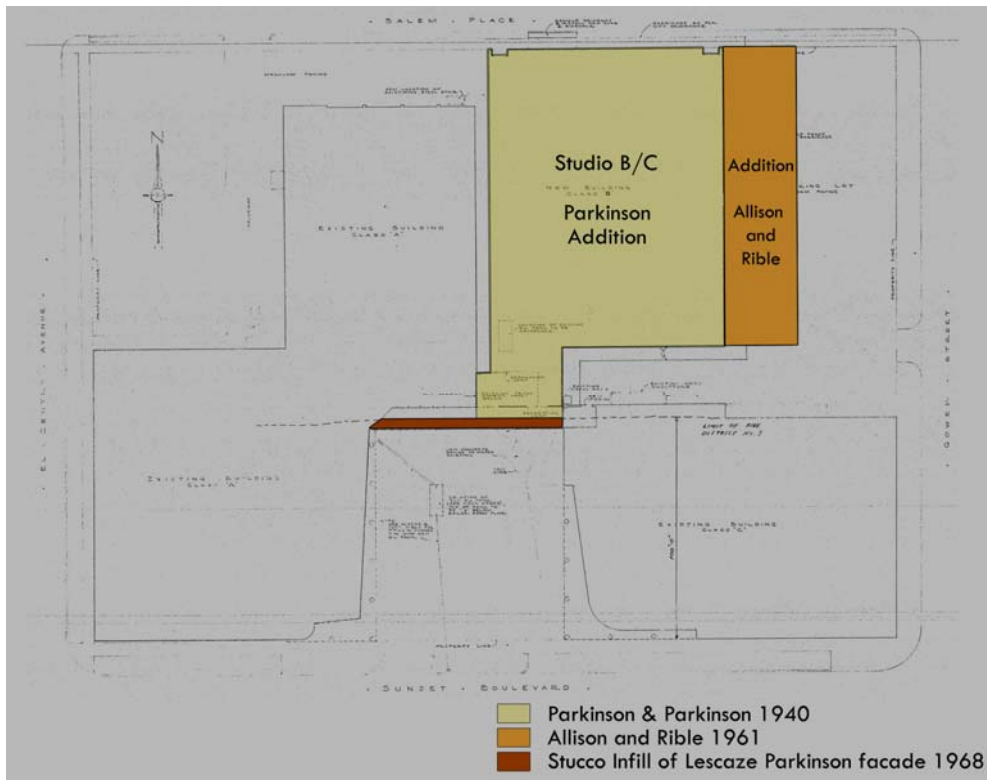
Annotated Site plan indicating 1939, 1961, and 1968 additions to the site
